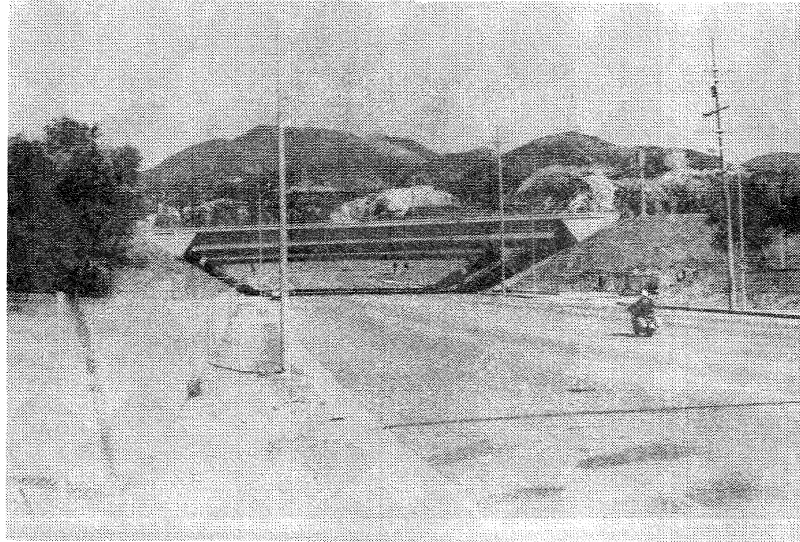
The Roxford Street Undercrossing, Foothill freeway. Twin 151 ft long prestressed box girder bridges. Horizontal load pile failures occurred on both bridges.
